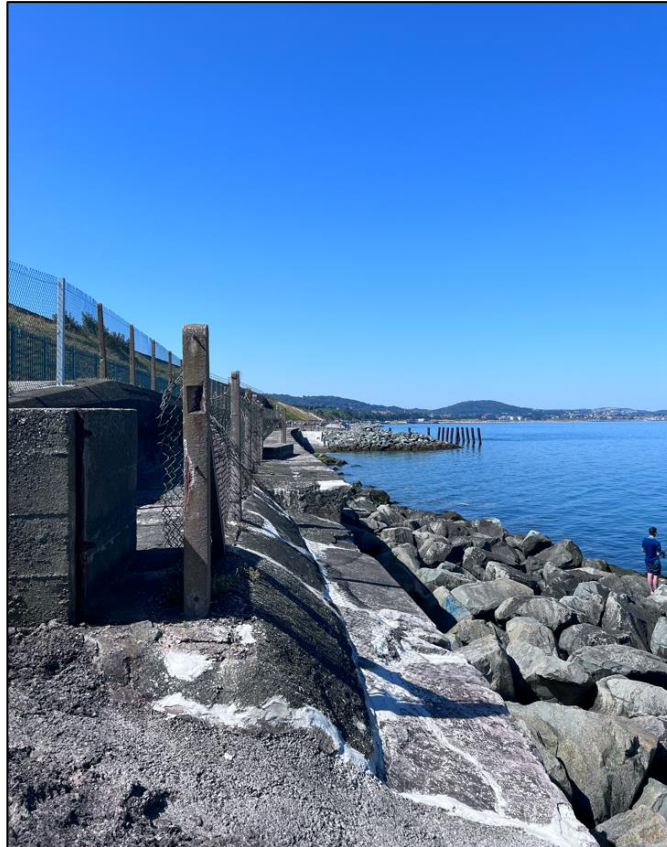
Second access steps to mid wall section. (Access ramp to beach further west).
